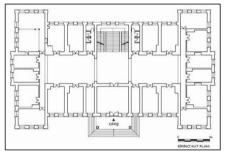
Bolu Government Office, First Floor Plan (Topçubaşı, 2009, 229)
